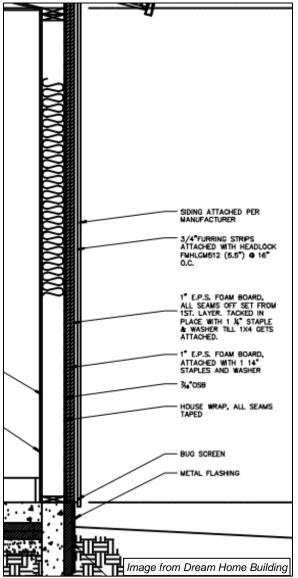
Option 2, 2x6 Intermediate Frame with Exterior Rigid Insulation: Two Layers of 1" EPS Foam. Wall Diagram and Material Specs.
